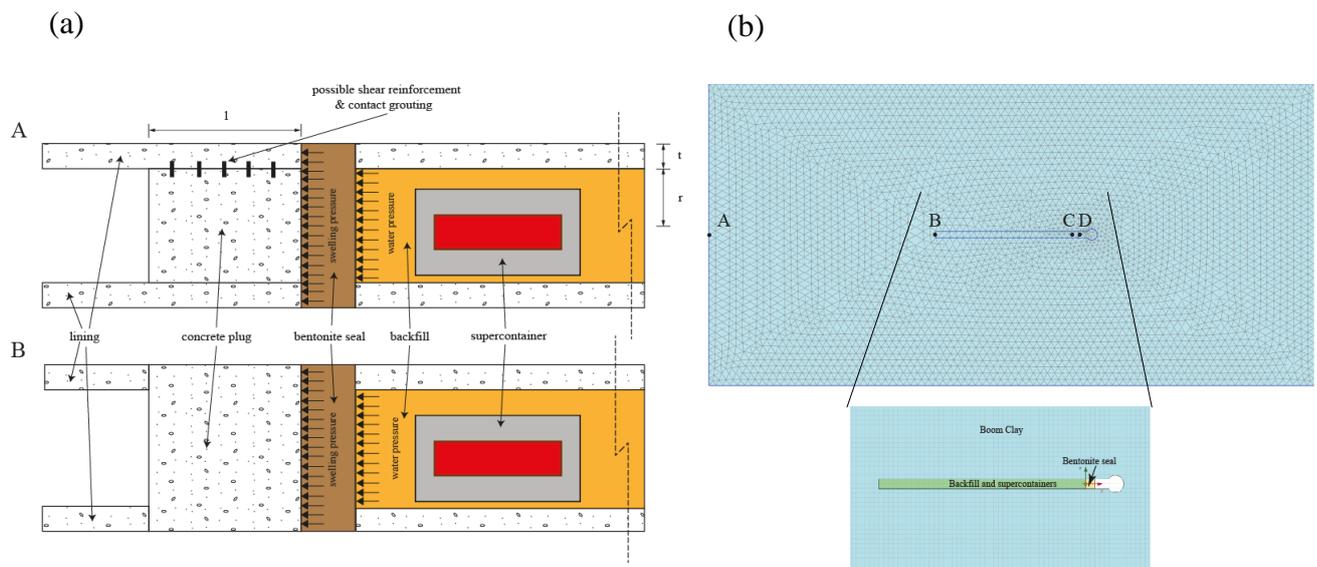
(a) Two types of conceptual plug system design; A: with the concrete plug installed inside the tunnel lining, and B: with the tunnel lining removed locally where the concrete plug is installed and (b) The mesh and details of the deposition tunnel and plug system used for the hydraulic simulation
